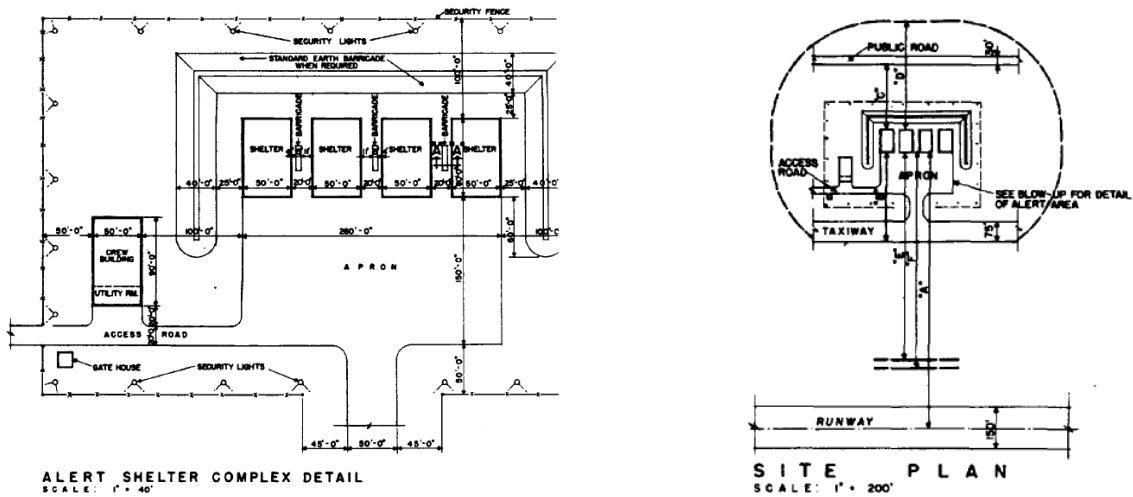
TWO SITE PLANS FOR ALERT SHELTERS, AD 39-01-88.
